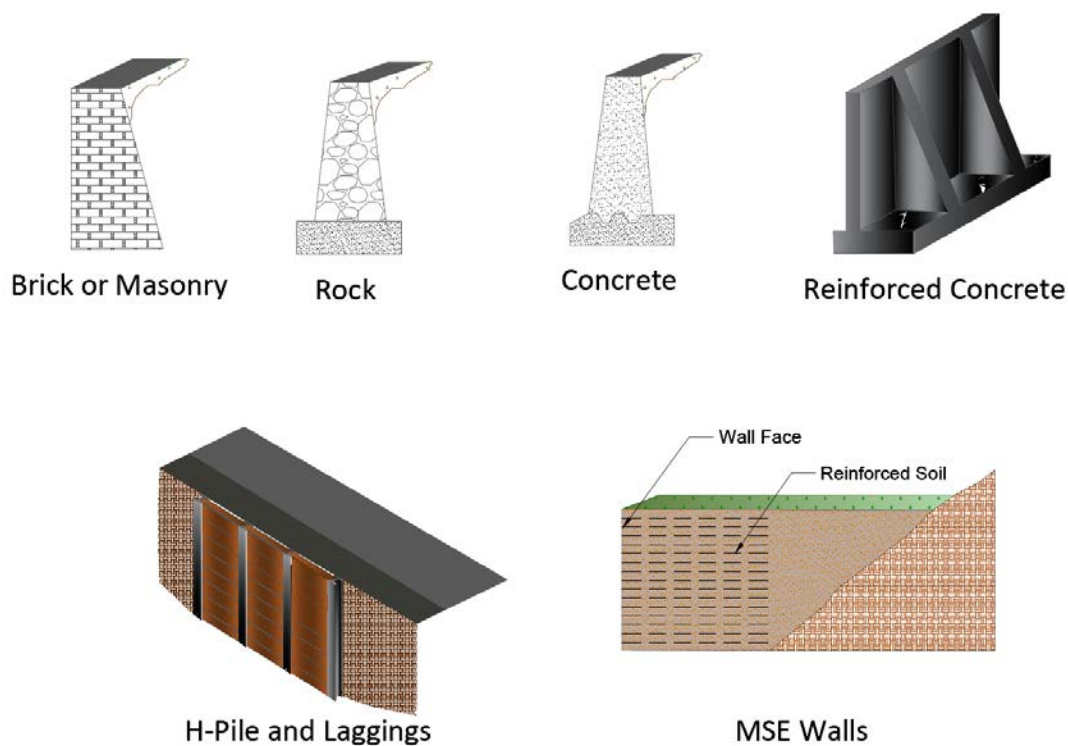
Examples of Common Retaining Structures (Adopted from Sheng (1990))
